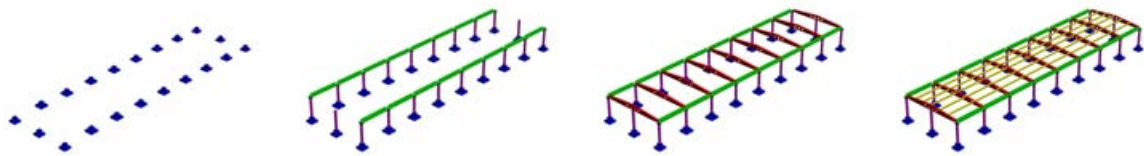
Differentiated assembly method; 1. foundations; 2. columns; 3. beams; 4. roof girders; 5. roof beams
